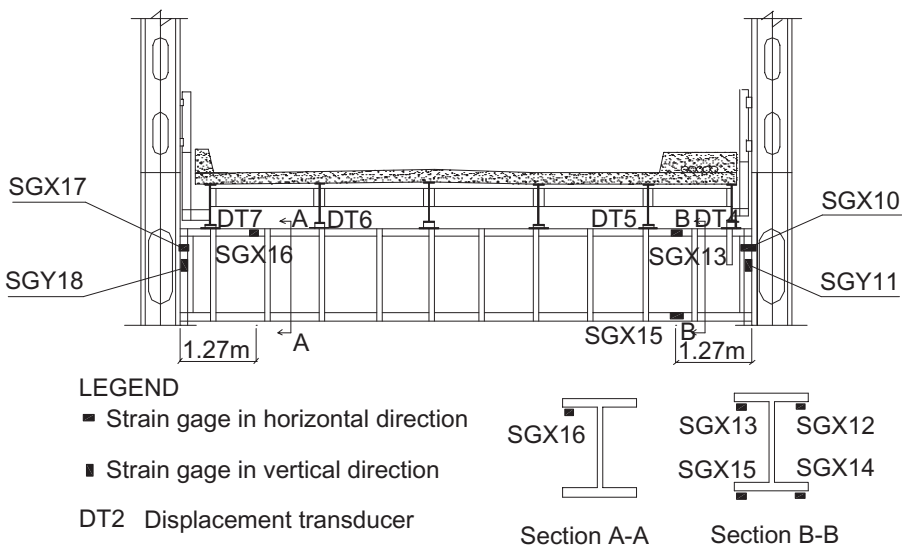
Instrumentation setup on floorbeam L1' (2004 Test).
